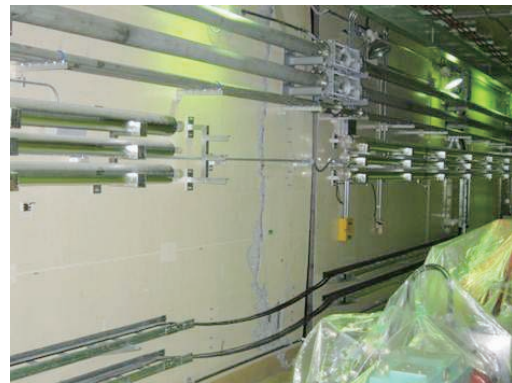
The damaged wall was about to fall down at the expansion joint between 3NBT and MLF, as if water ducts for the M1 and M2 air circulation systems, were supporting the wall.
